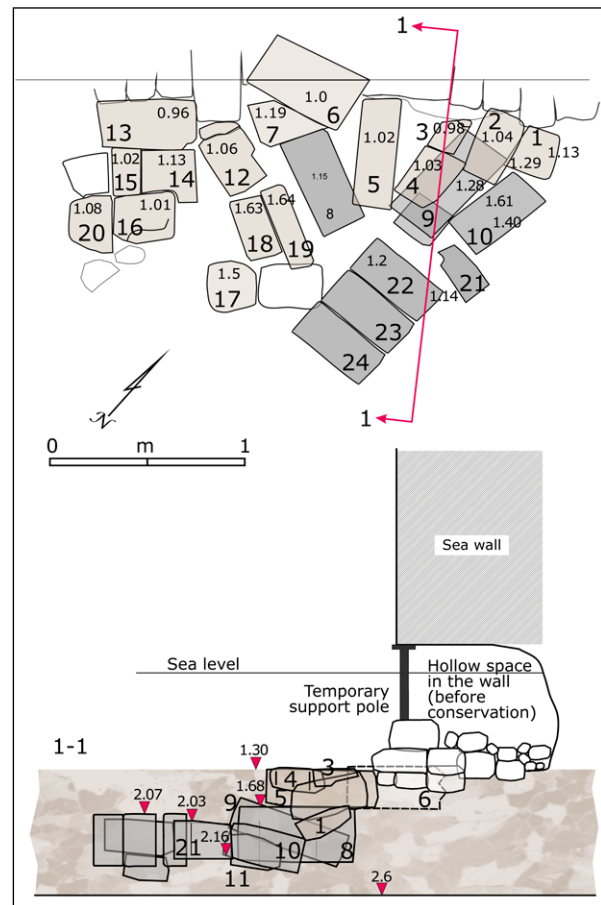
Plan and cross-section of the rockslide and the part of the foundation, stones 22-24 (Drawing: S. Ben-Yehuda).
